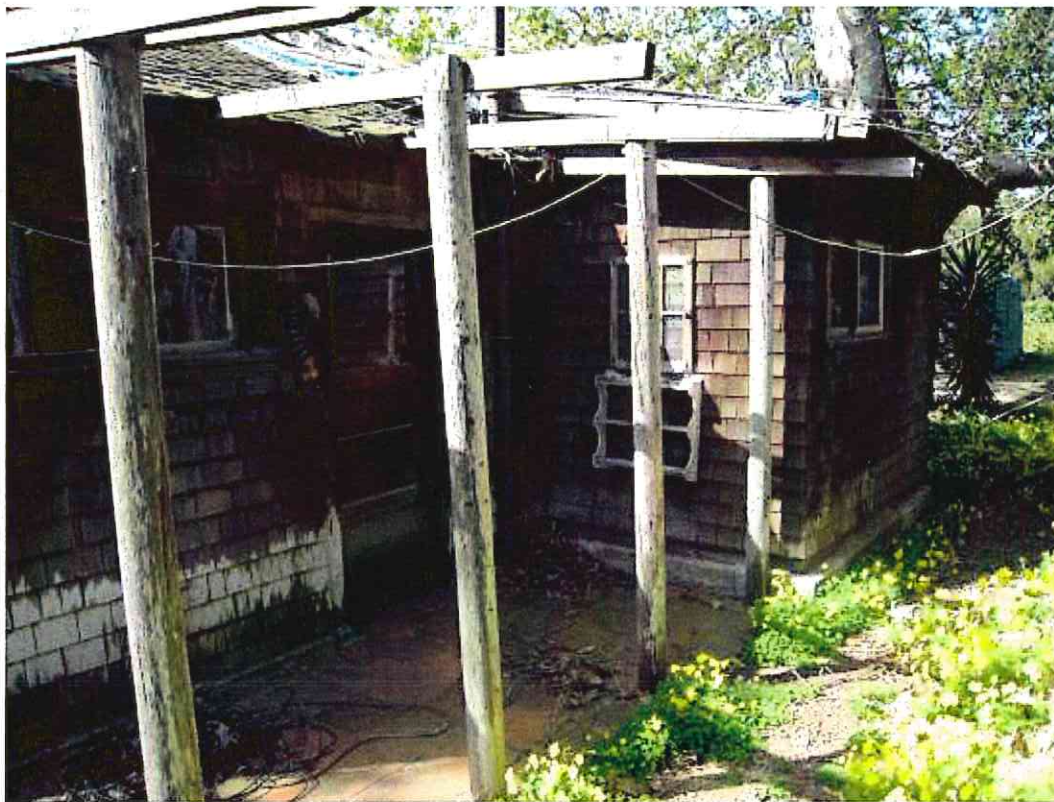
Detail of north elevation, showing roofline of wing at right to be extended eastward. Facing southwest. April 2010. A. C. Cole
